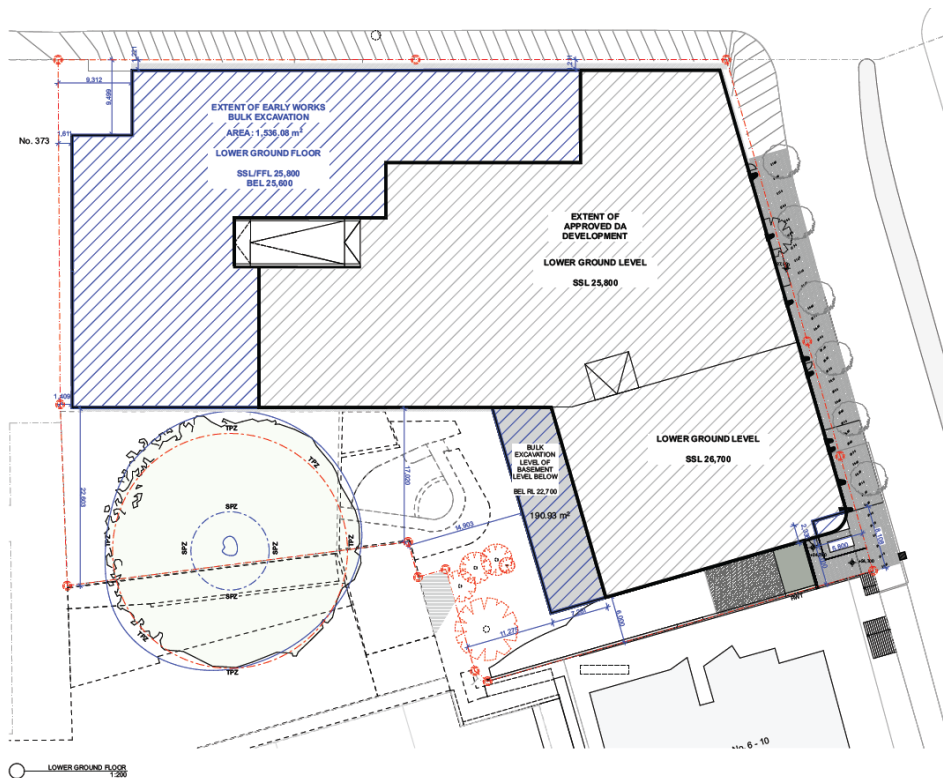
Proposed bulk earthworks lower ground level (Source: BKA Architecture)
